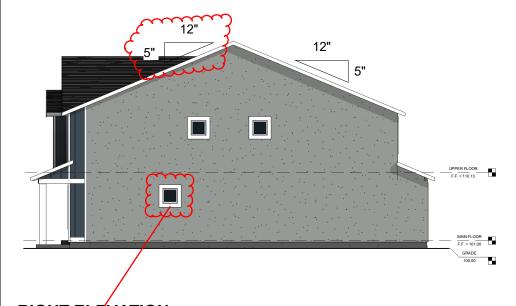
# EXHIBIT B PROPOSED DEVELOPMENT PLANS
